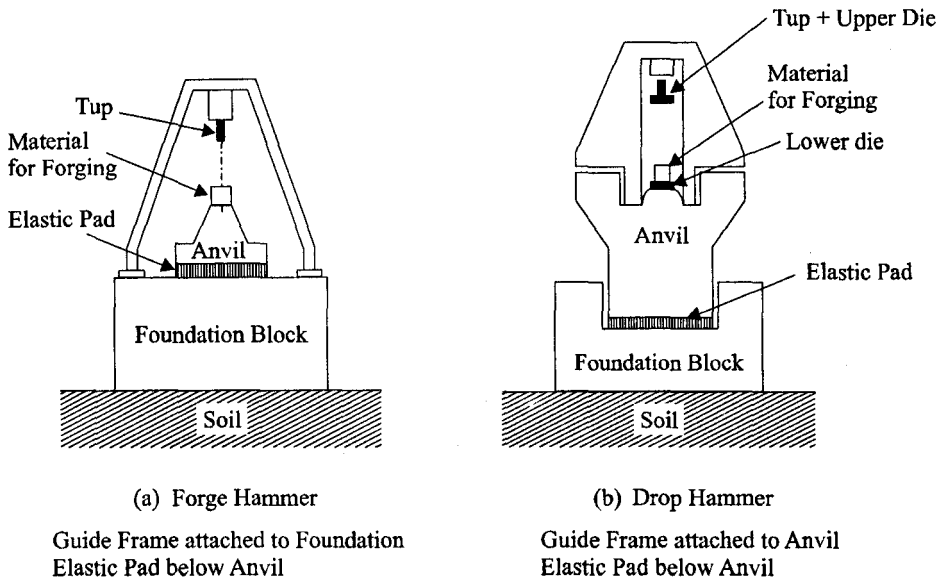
A Typical Arrangement of a Hammer Foundation
